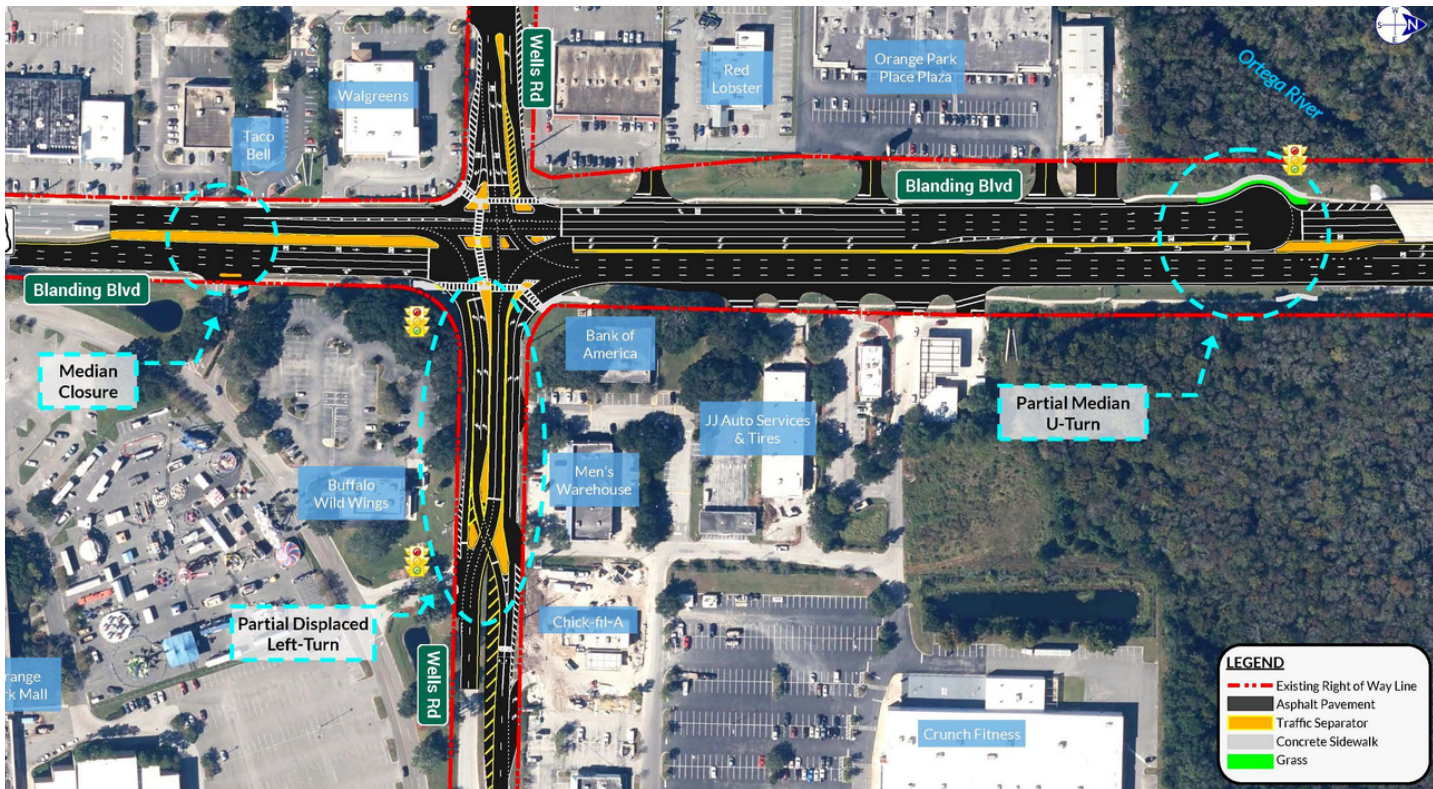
IMAGE: FDOT proposed improvements to the Blanding Boulevard/Wells Road intersection
